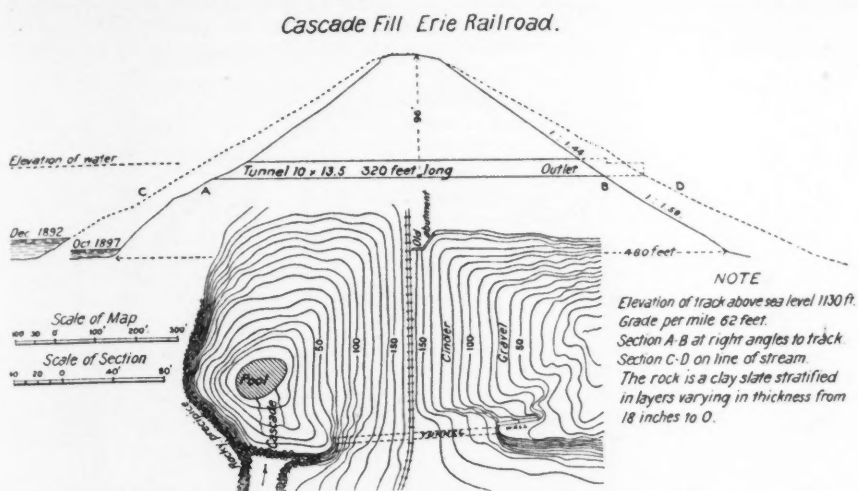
SKETCH PLAN AND SECTIONS SHOWING CONSTRUCTION OF THE CASCADE ROCK FILL ON THE ERIE R. R.
